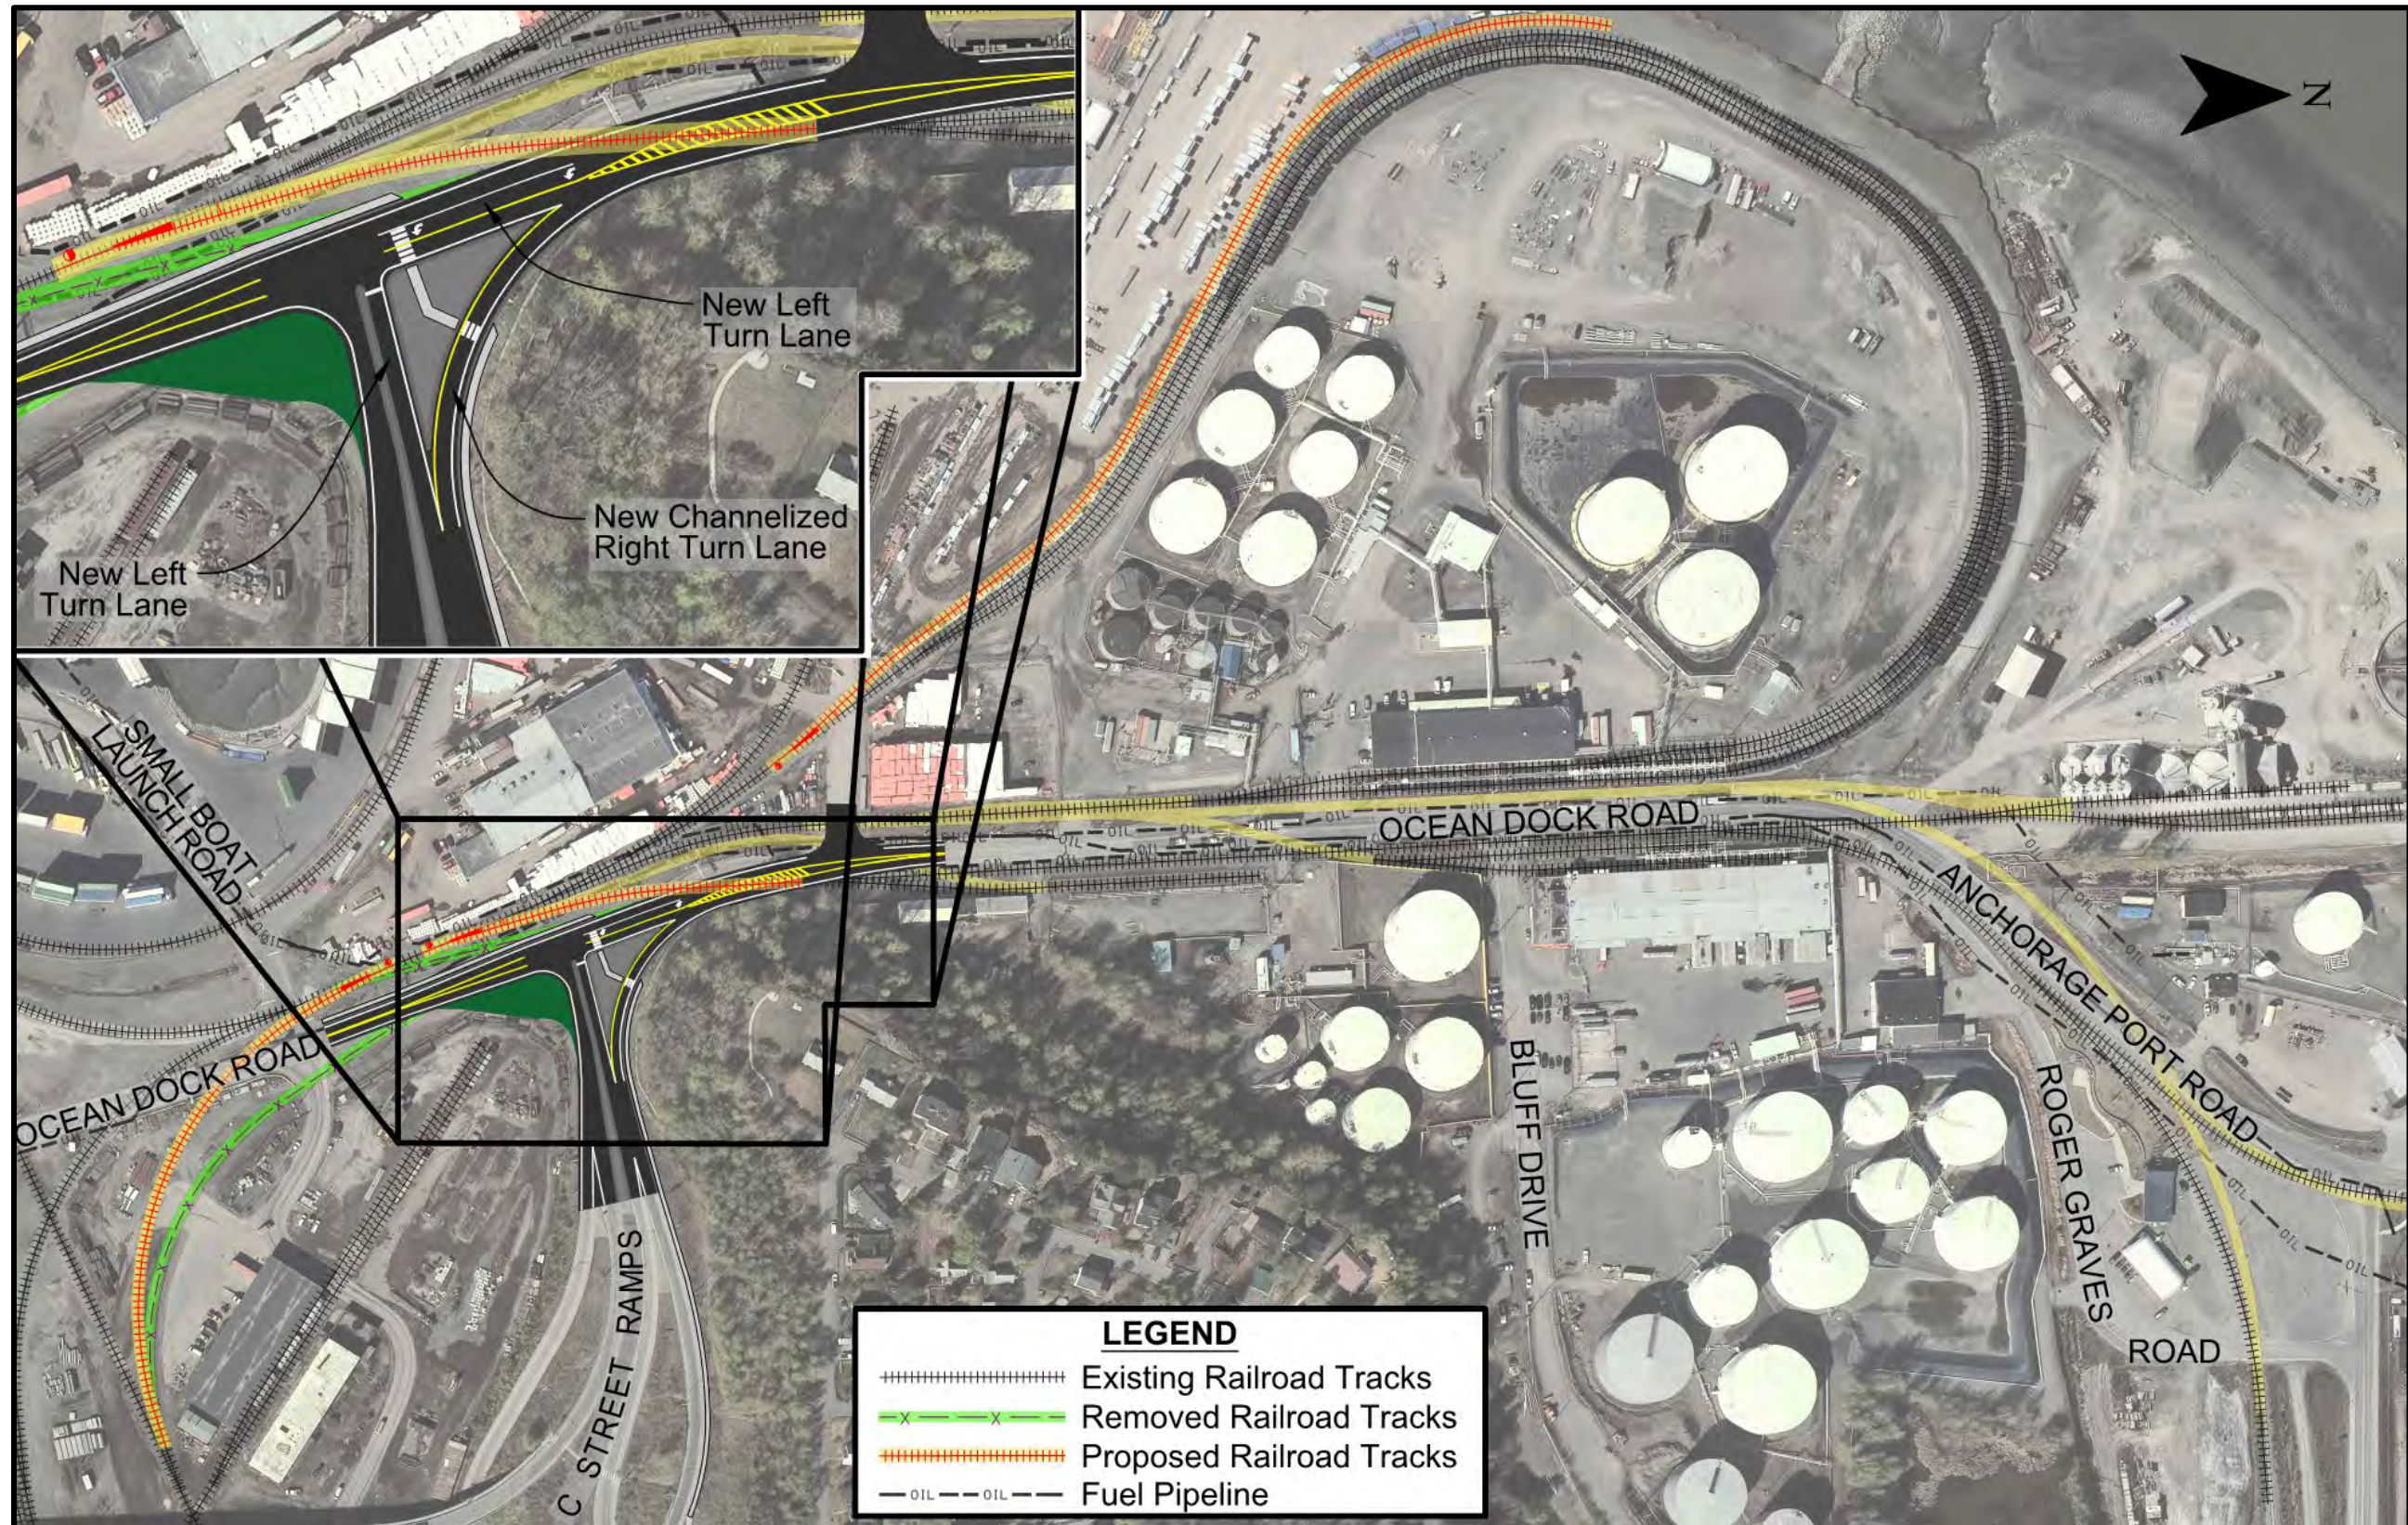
Road Concept B (Realigned T Intersection) with Rail Concept 2
